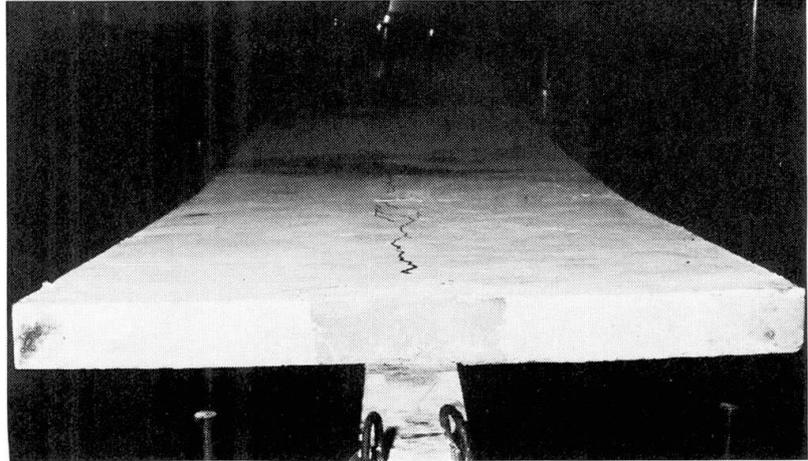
Longitudinal cracks on the concrete slab surface along the line of shear connectors at the ultimate load
